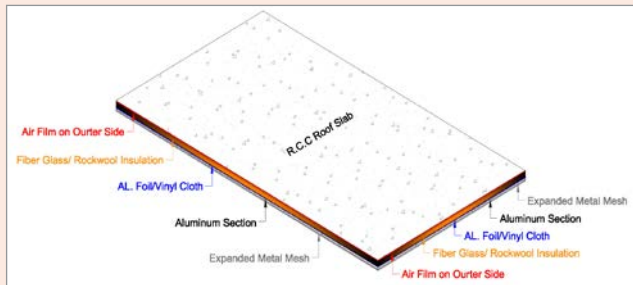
Underdeck insulation with fiber glass / rockwool insulation for R.C.C. roof slab
